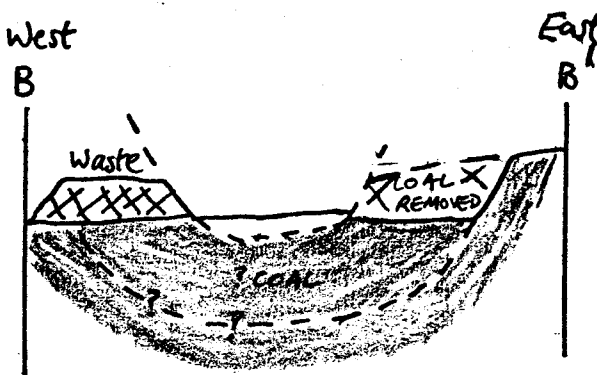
DIAGRAMMATIC SECTION B-B' THROUGH OPEN PIT
